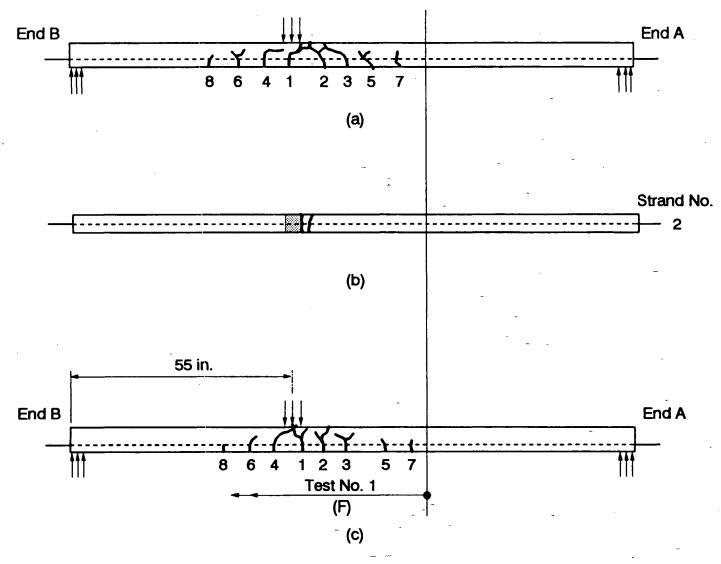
Crack pattern for D-type Specimen No. 11-6.0DU-2: (a) mirrored side view along Strand No. 2; (b) top view;
